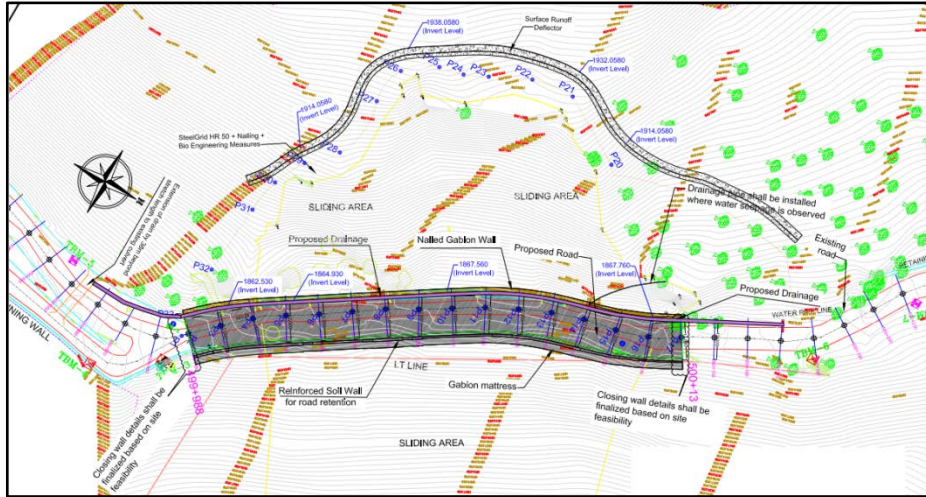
Drainage plan showing mitigation measures on hill side of the road
